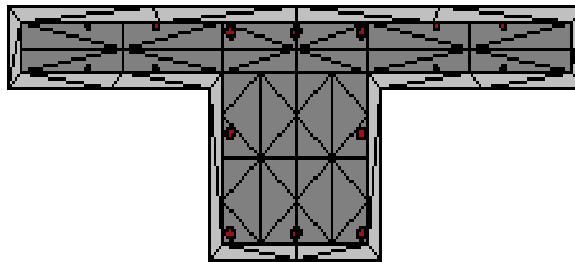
Inner beam fiber section of T- beam section 0.4x0.35 (8 No.18) for 15 story.
